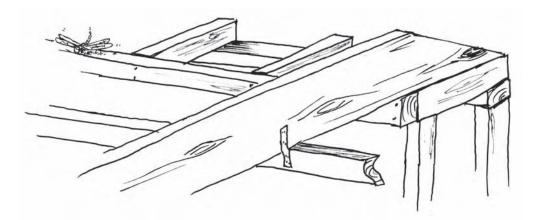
Installation of a hanger with an angle cut supported on a jack joist
